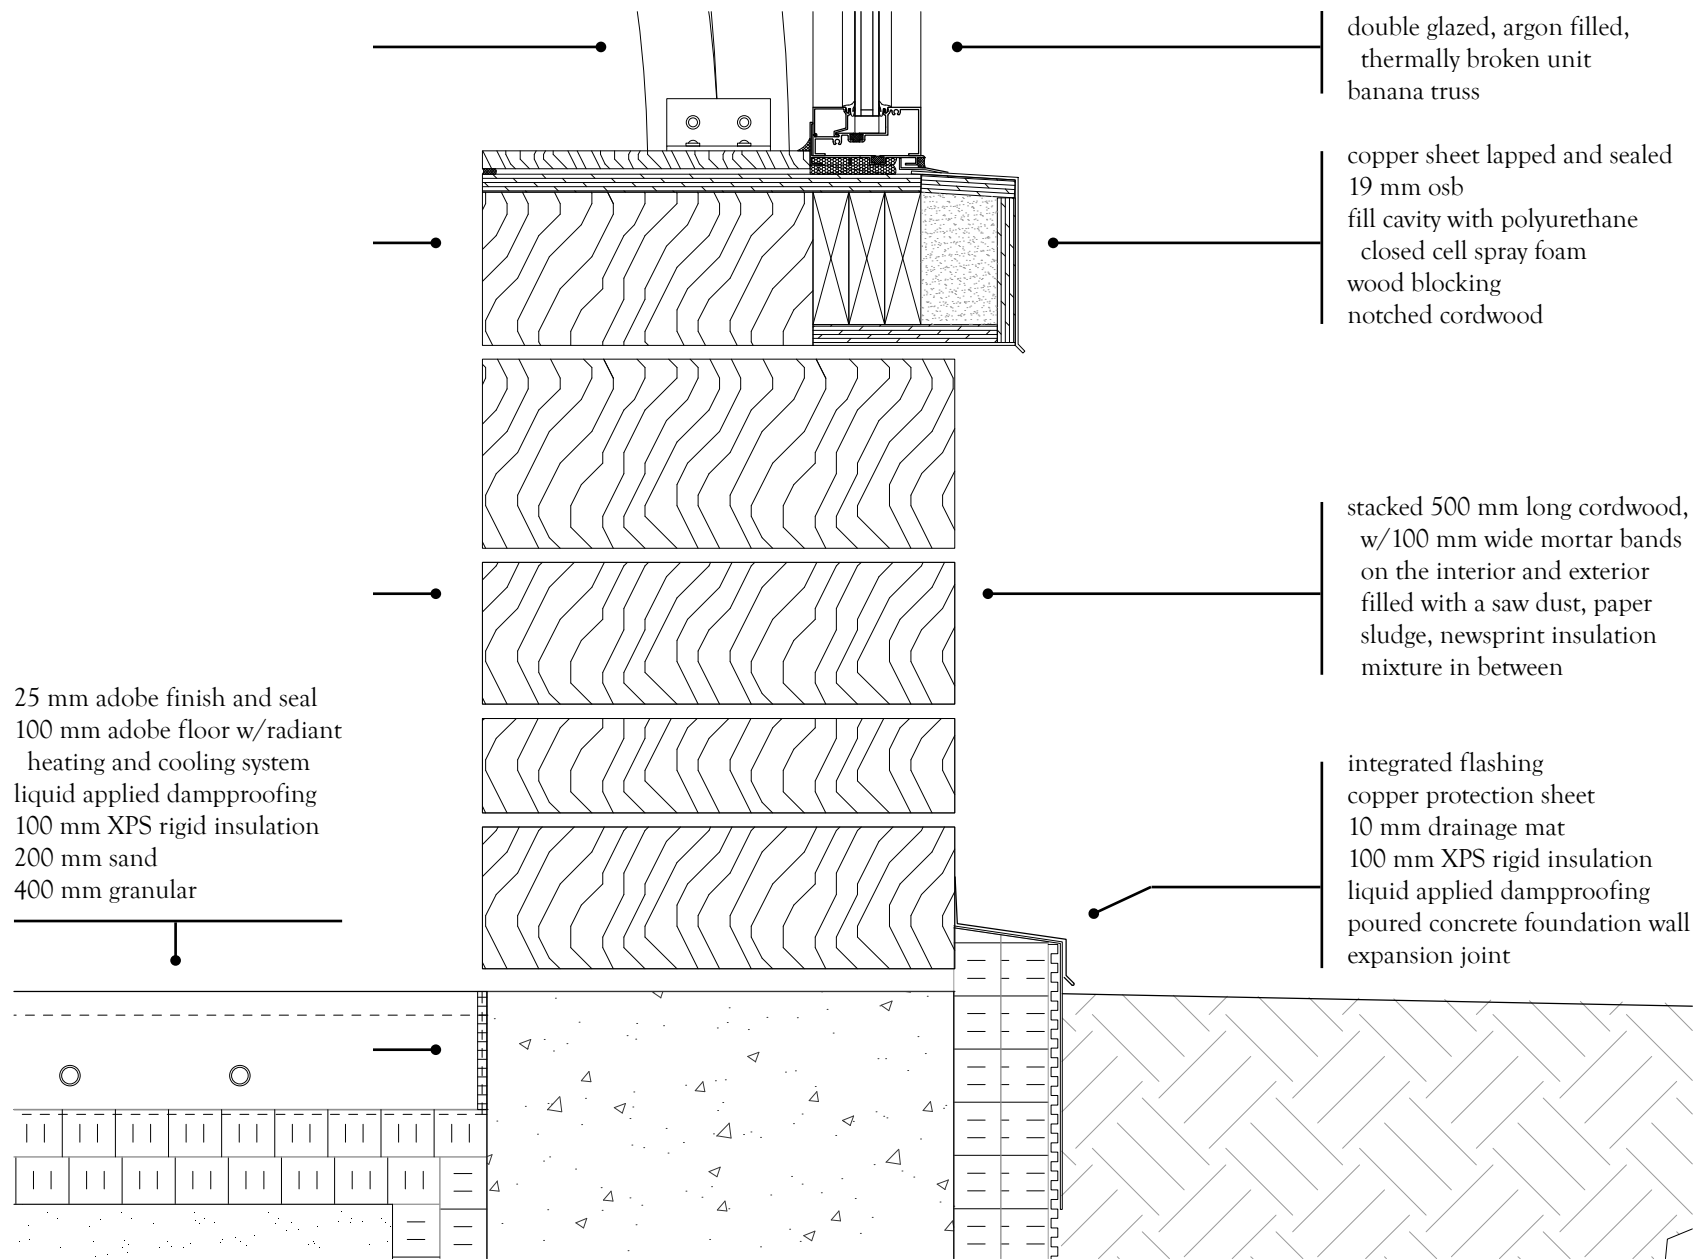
Detail E - Window sill to cordwood wall to slab + footing
